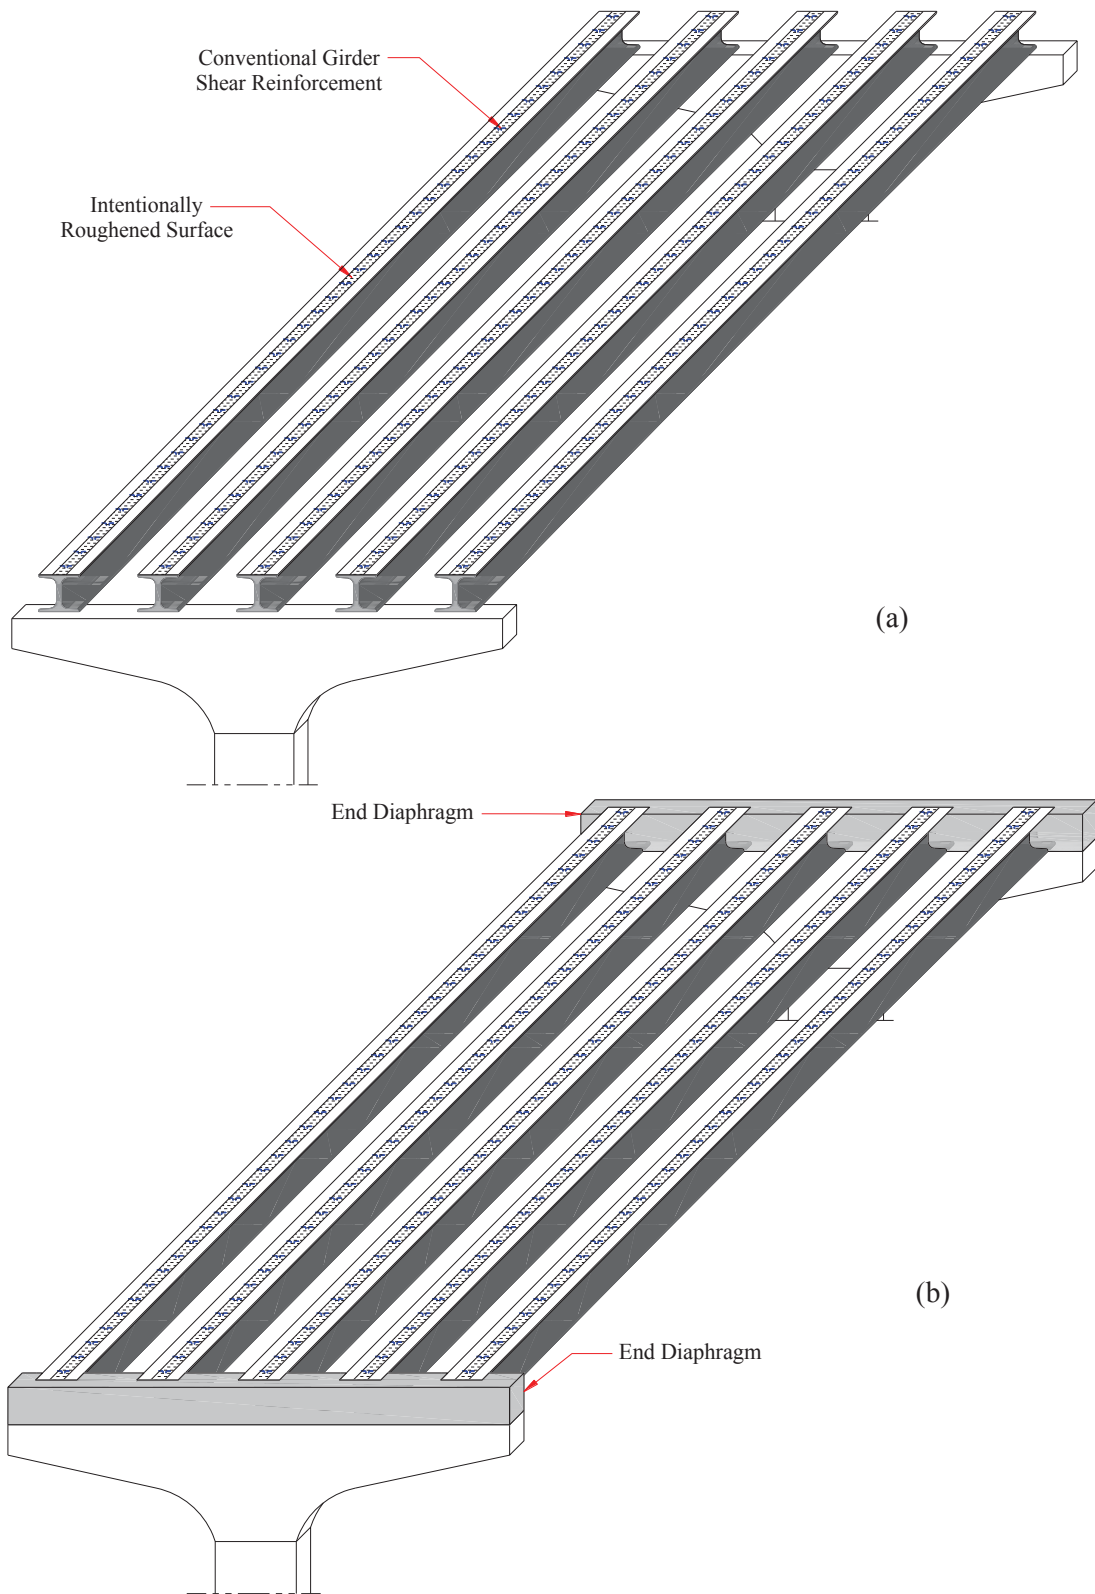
Construction Sequence of the Proposed Precast Concrete Deck-to-Concrete Girder Connection Using UHPC
